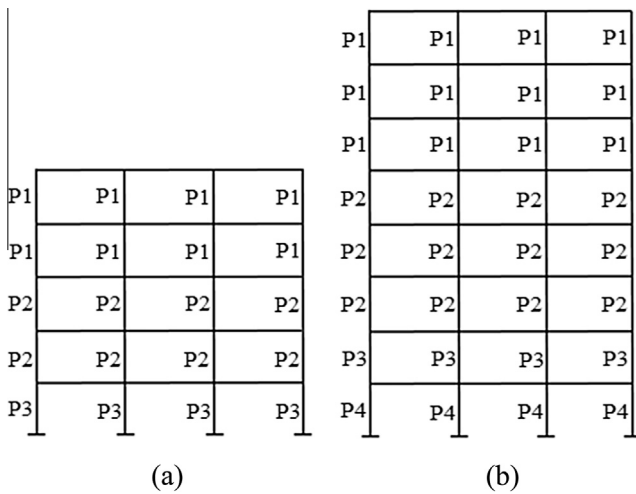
Elevation view of the analysed structures. (a) 5-storey frame. (b) 8-storey frame.
